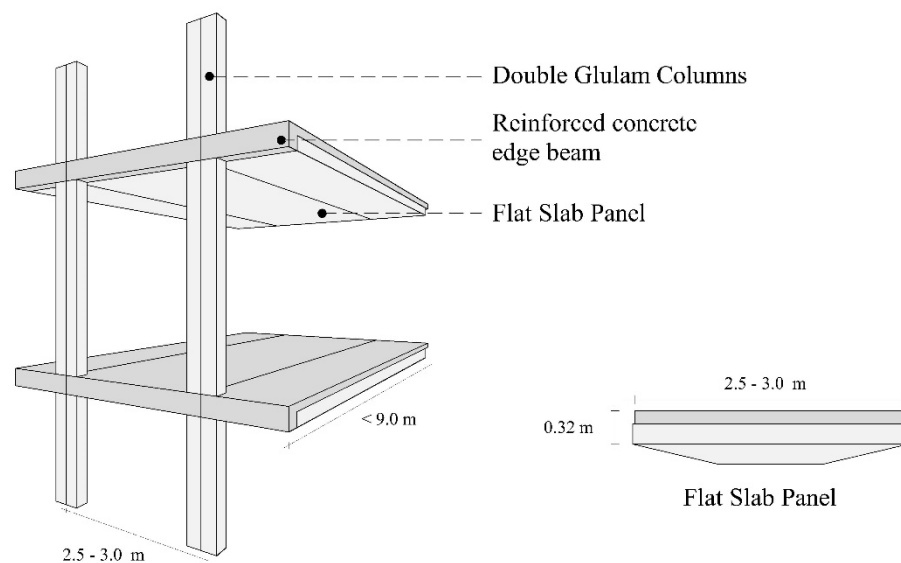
Flat slab Panel of CREE system (Modified from CREE Buildings)
